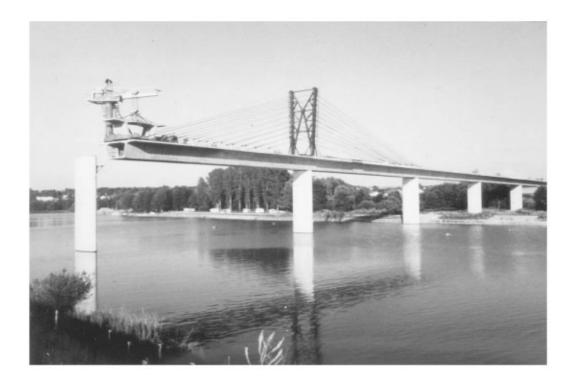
Fontenoy Bridge. (Courtesy of Campenon Bernard.)
